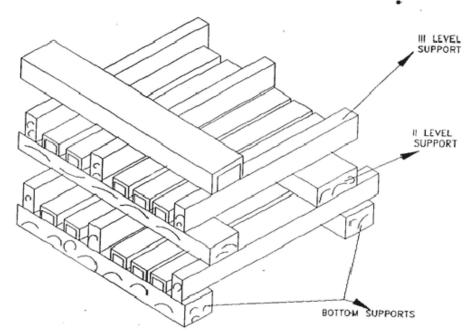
STRUCTURAL STEEL STACKING ARRANGEMENT
